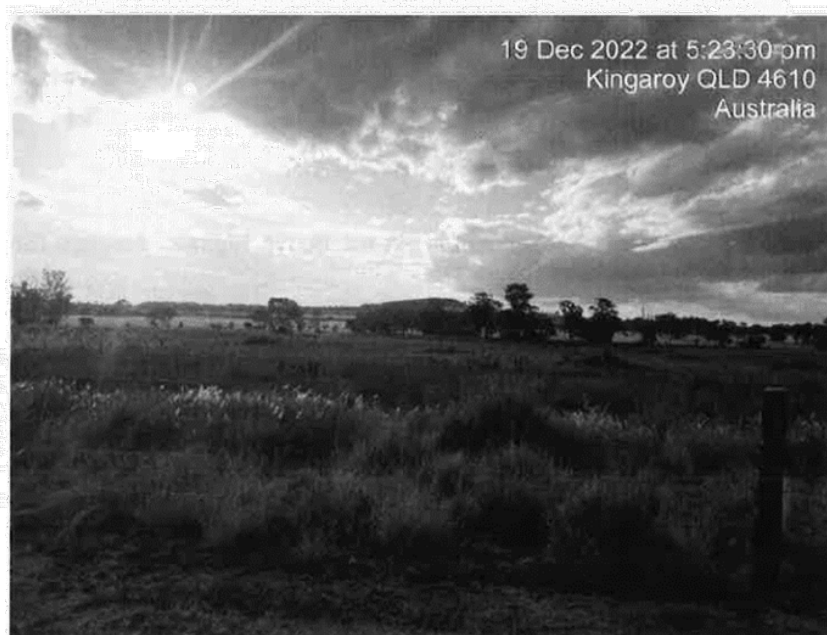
Pre-development site photo (Looking west towards the lawful point of discharge)
